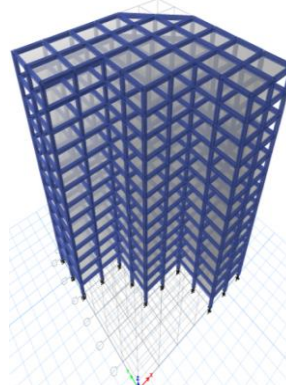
Structure in Elevation view (Elevation view are same in all cases)
